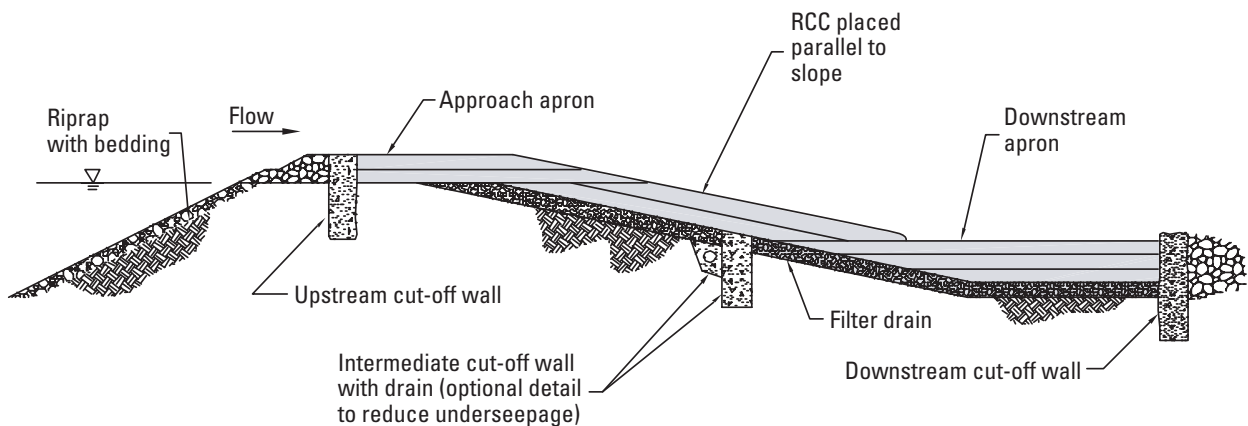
Overtopping protection with RCC placed parallel to chute (plating).
